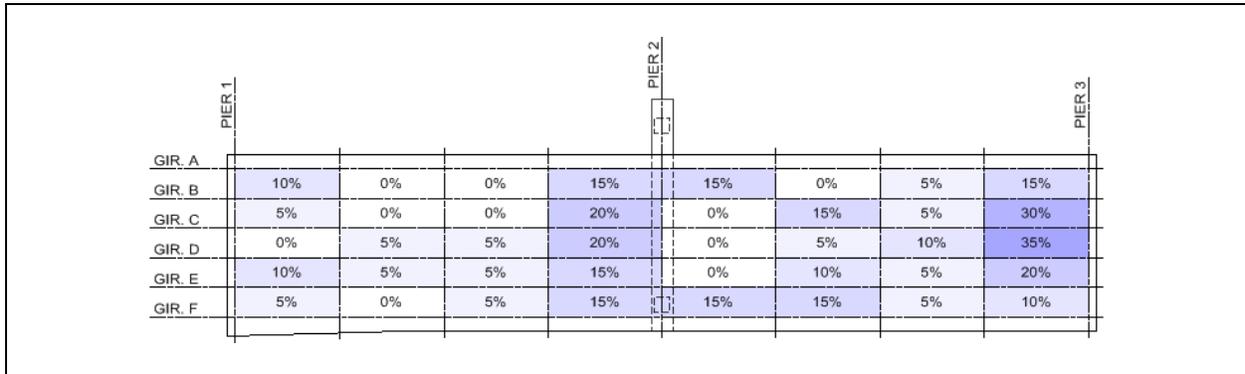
Bridge 16/3W Crack Intensity Diagram
